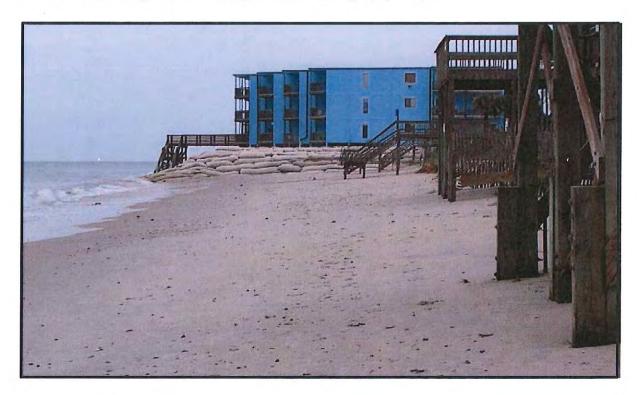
Sandbags revetment at Topsail Reefs Building 1 (Sep 2014).
